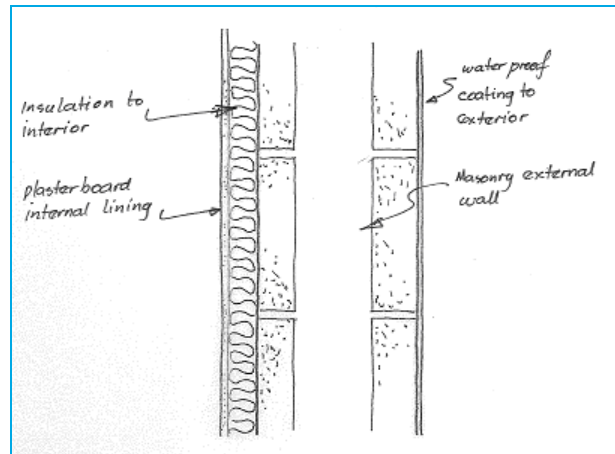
Typical Section - Insulated Exterior Walls (Strapping omitted for clarity)
